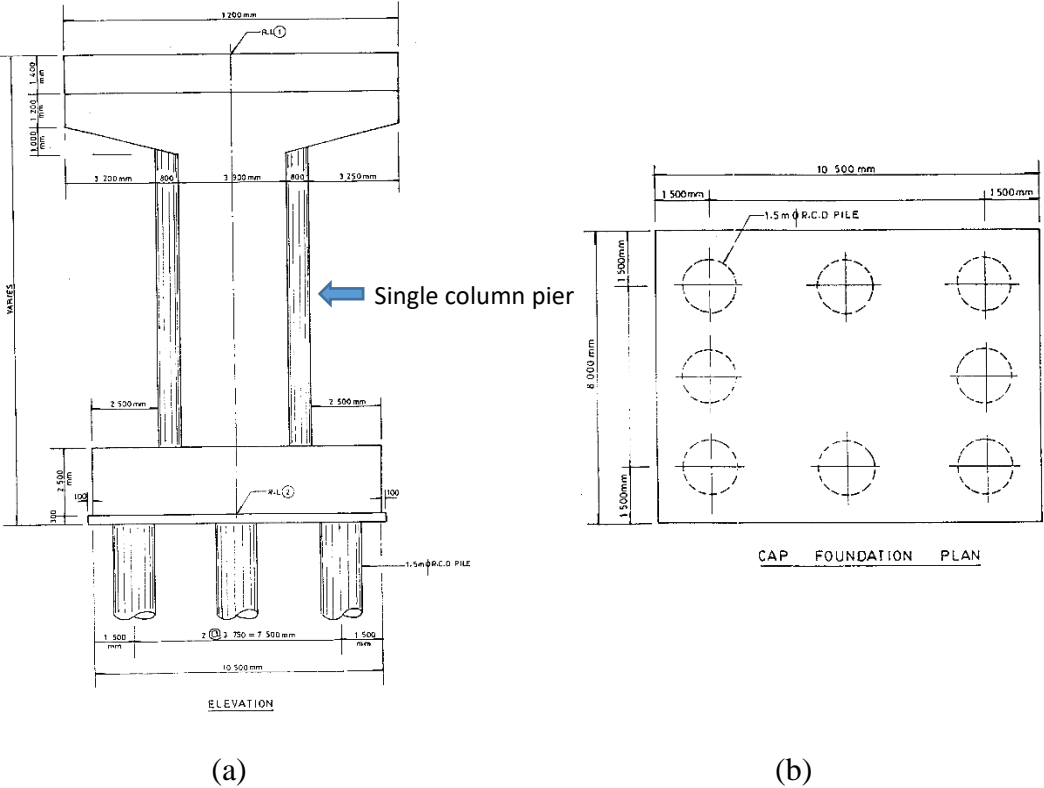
(a) Single column pier P4 and P8; (b) Pile cap under pier P4 and P8.
